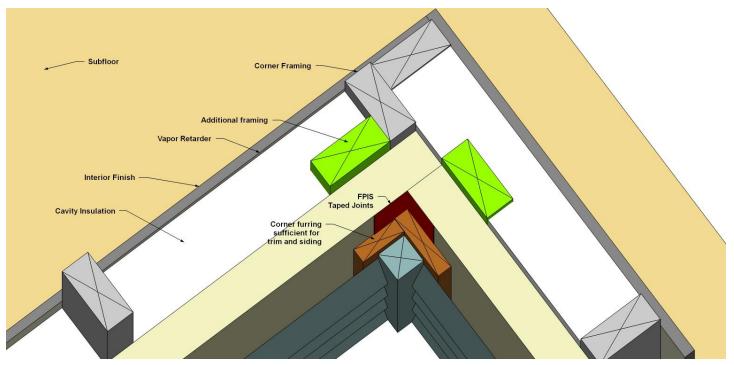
Inside Corner: Wood Frame Wall with Continuous Insulation, FPIS Taped (WRB), Furring, and Lap Siding (Provide sufficient framing to attach siding trim and siding as well as interior finish.)
